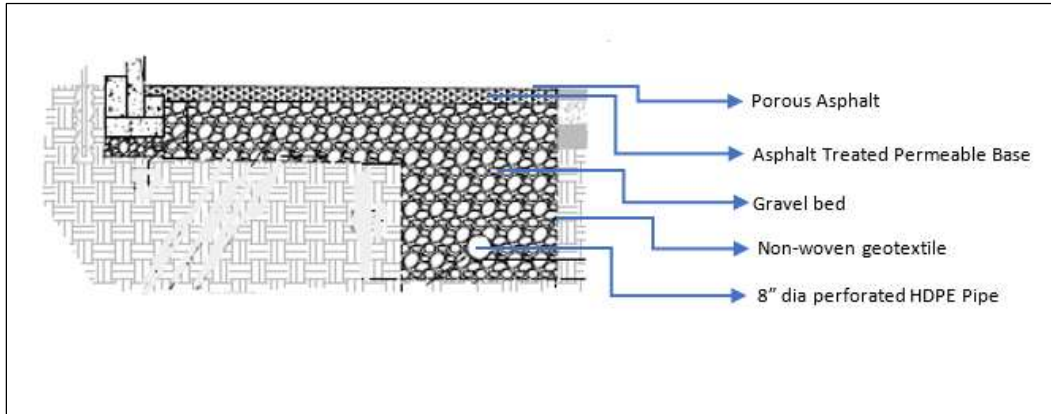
Schematic diagram of a typical STR permeable pavement (CH2MHILL)
